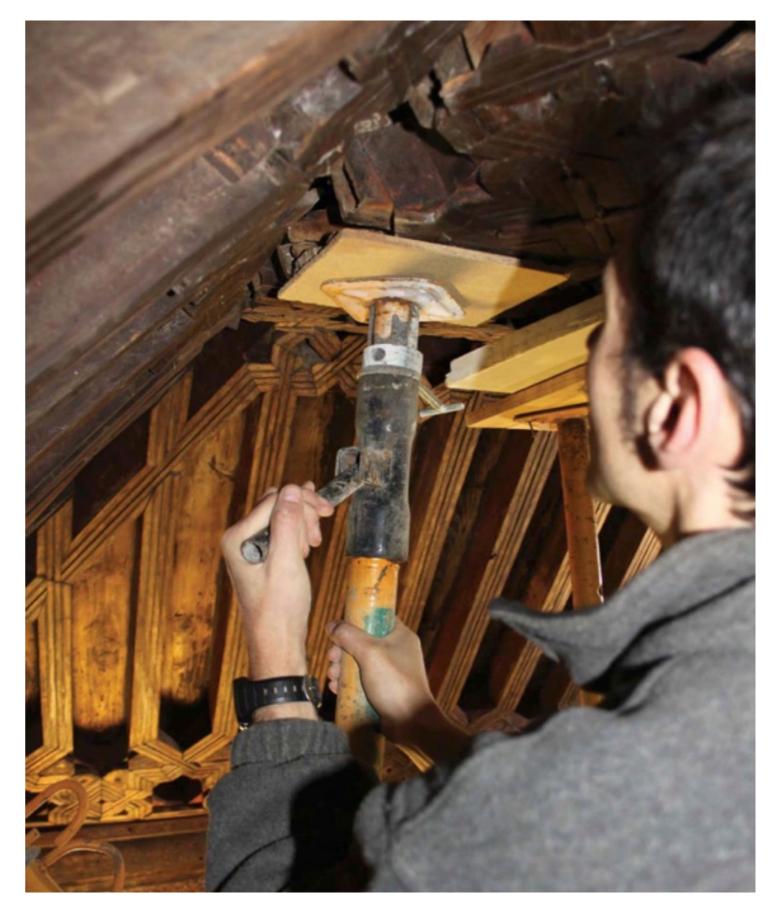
(*left*) Replacement of a section of the original Nasrid timber wall plate
